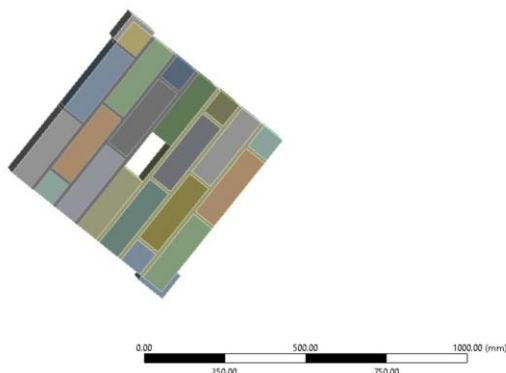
Model of un-strengthened wallette subjected to diagonal compression
